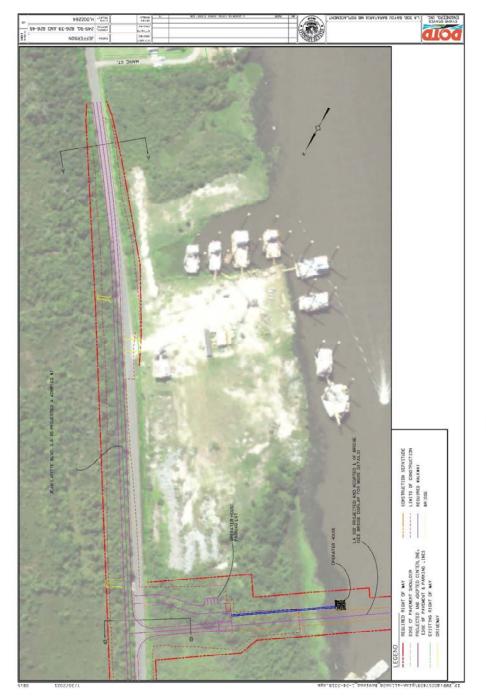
Proposed plan layout LA 45 and bridge (LA 302).
